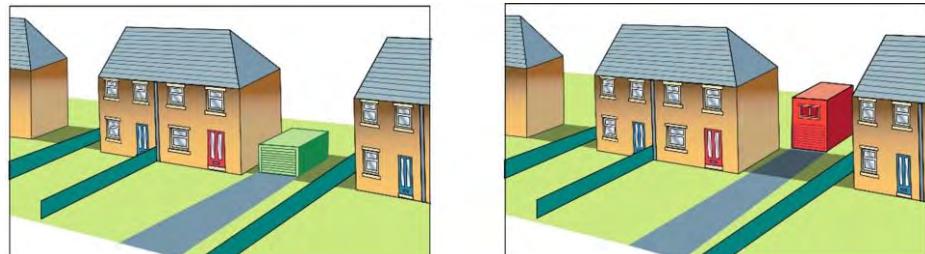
The left image shows an example of a suitable single storey outbuilding set back from the building line with suitable garden space retained. The right image shows an unsuitable outbuilding which is two-storey, set back too far from the building line and removes too much garden space.
